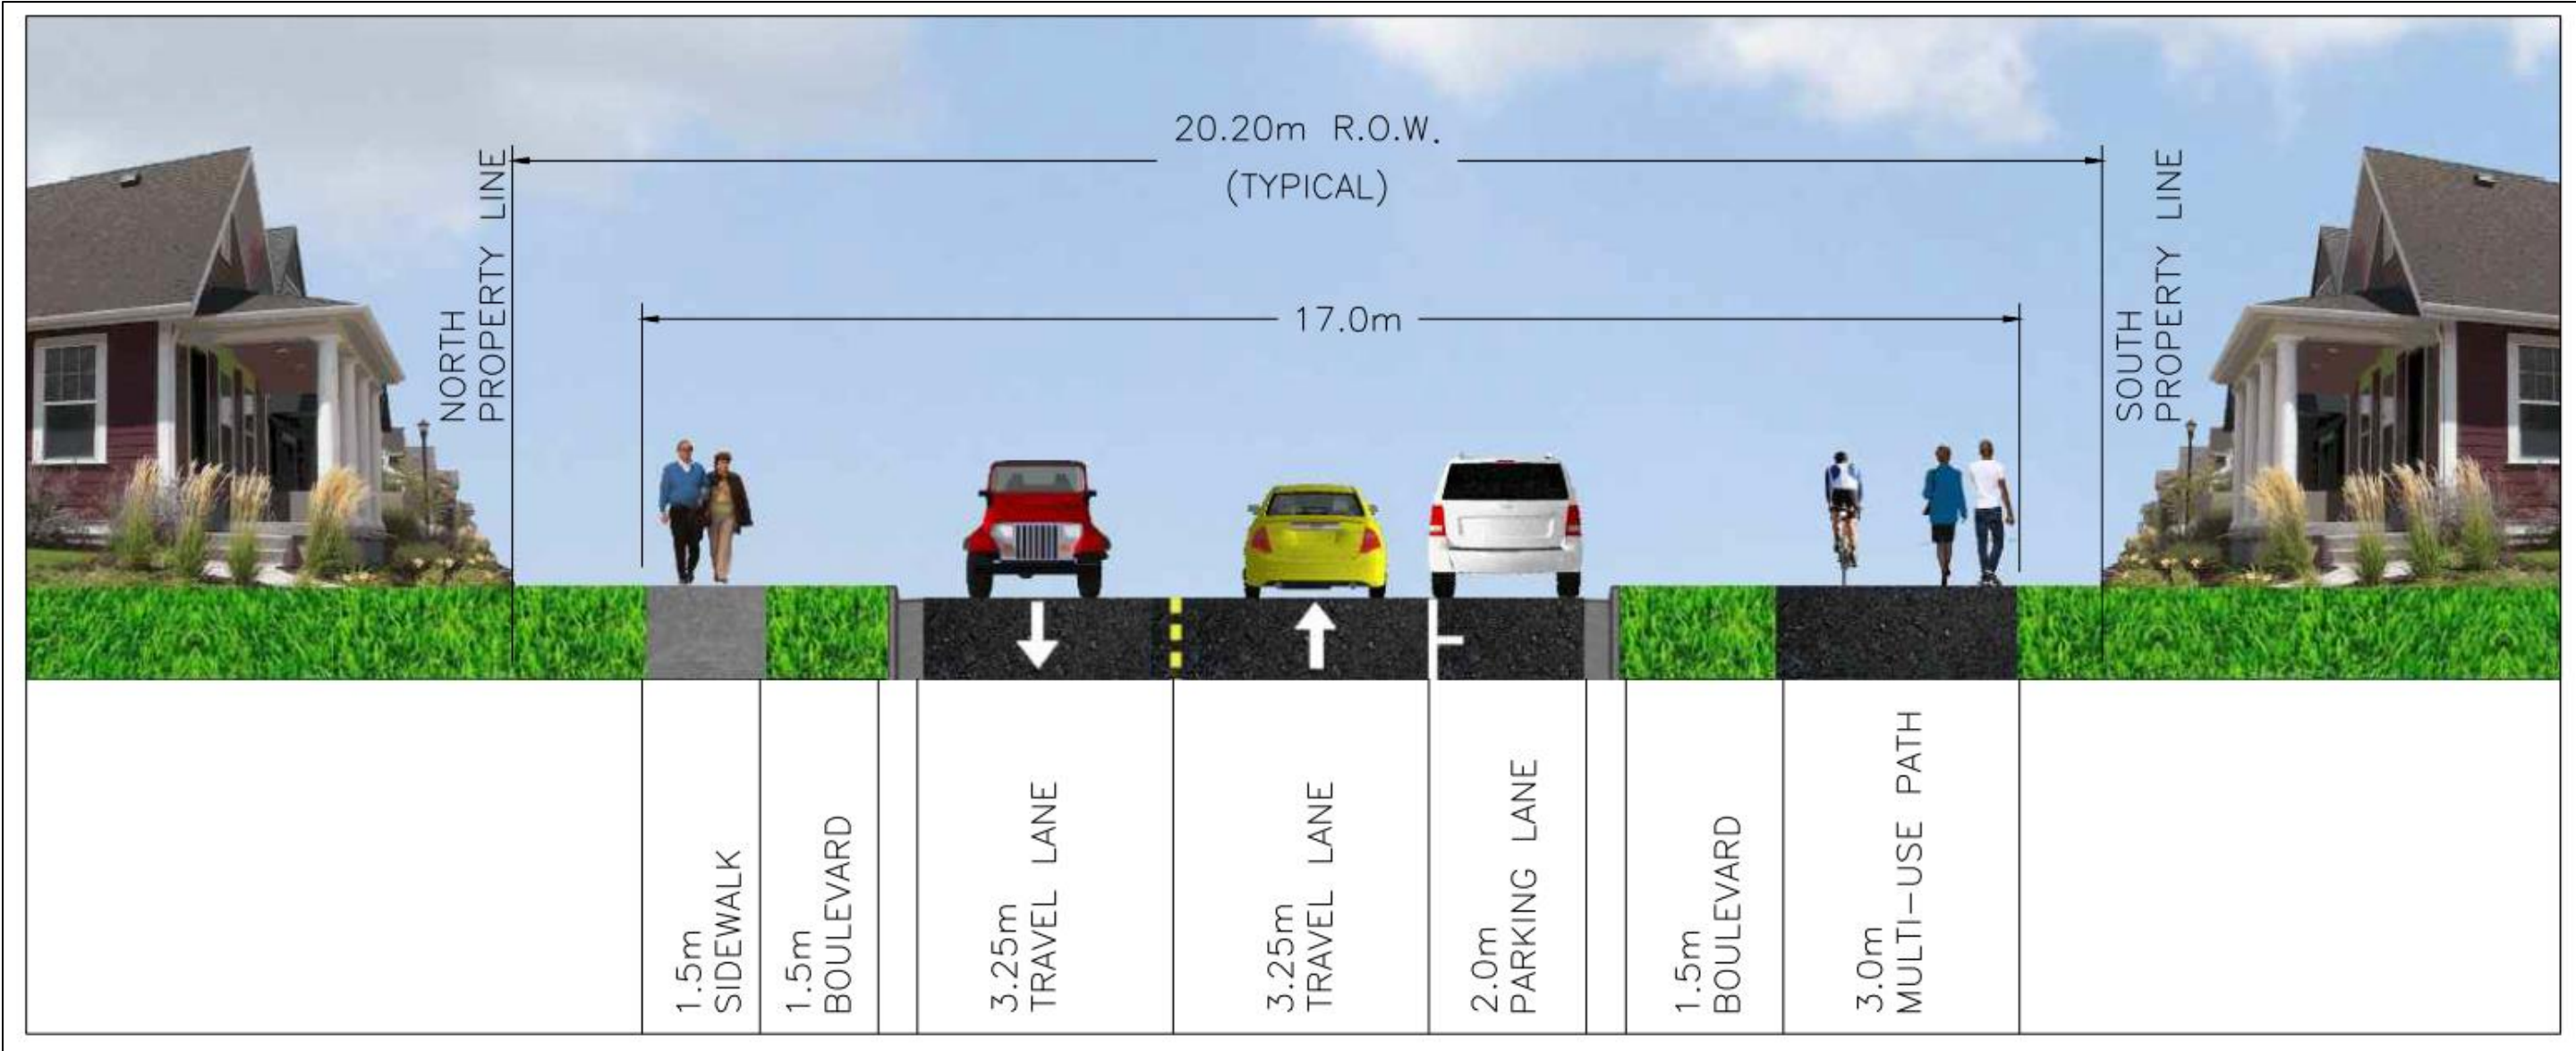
Typical Section (Townline Road West Preferred Solution)
